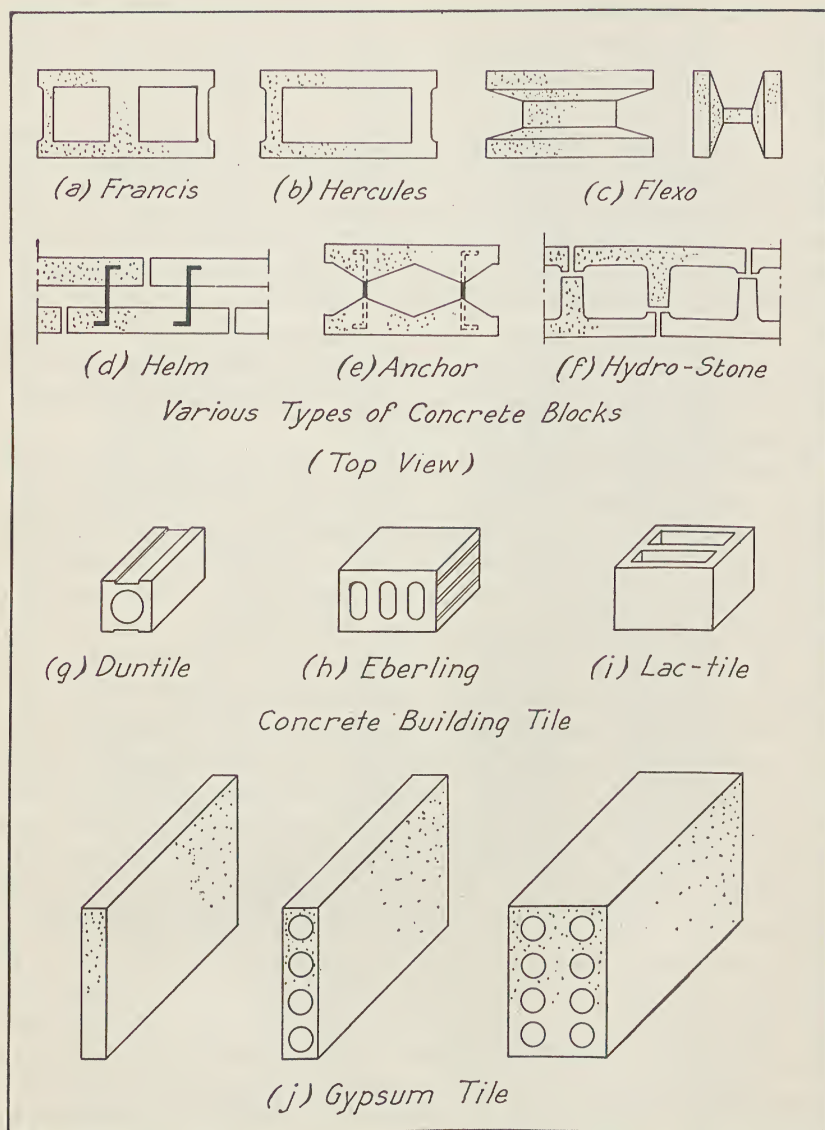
Concrete Block and Tile, and Gypsum Tile
